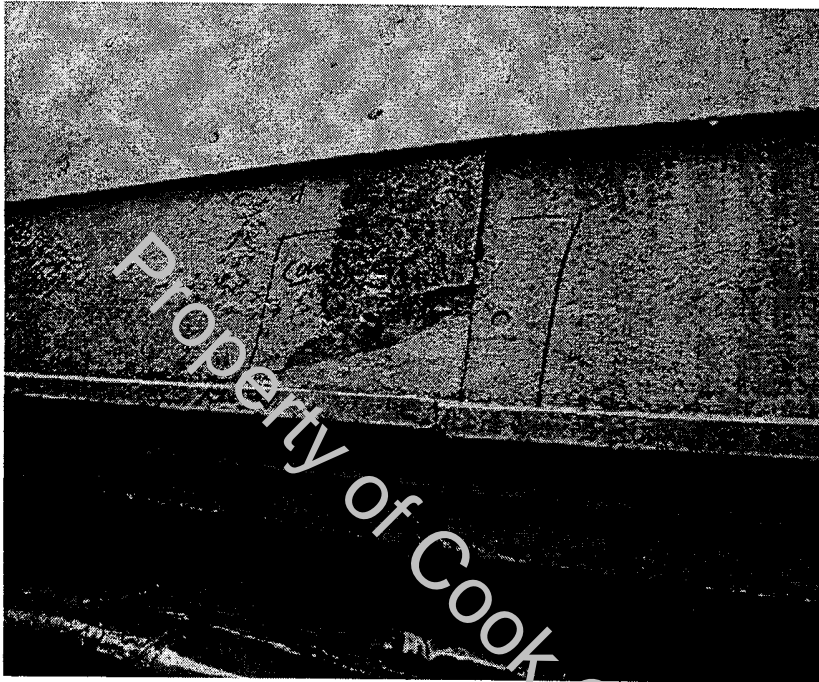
Cracked cast iron at floor line. Note that crack extends through fastener. Note peel-and-stick membrane below which has been painted green.
